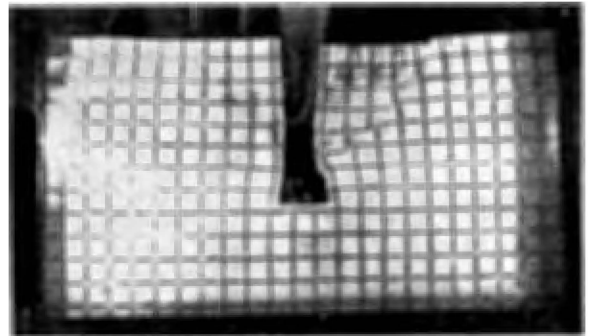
Deformation of the ground model just after the collapse (TRE 2).
